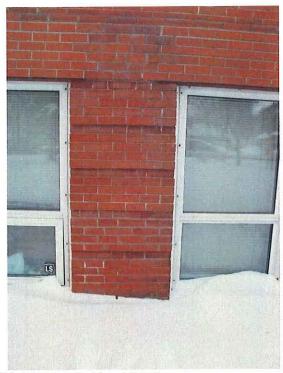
running bond on steel lintels (replaced brick arch lintel)
